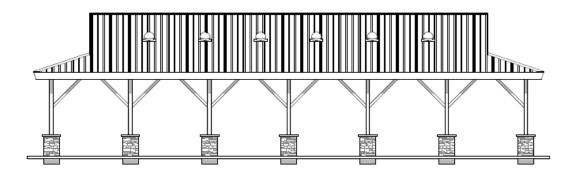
Preliminary Design Stage - Front (walls on either side are curved cement block)
